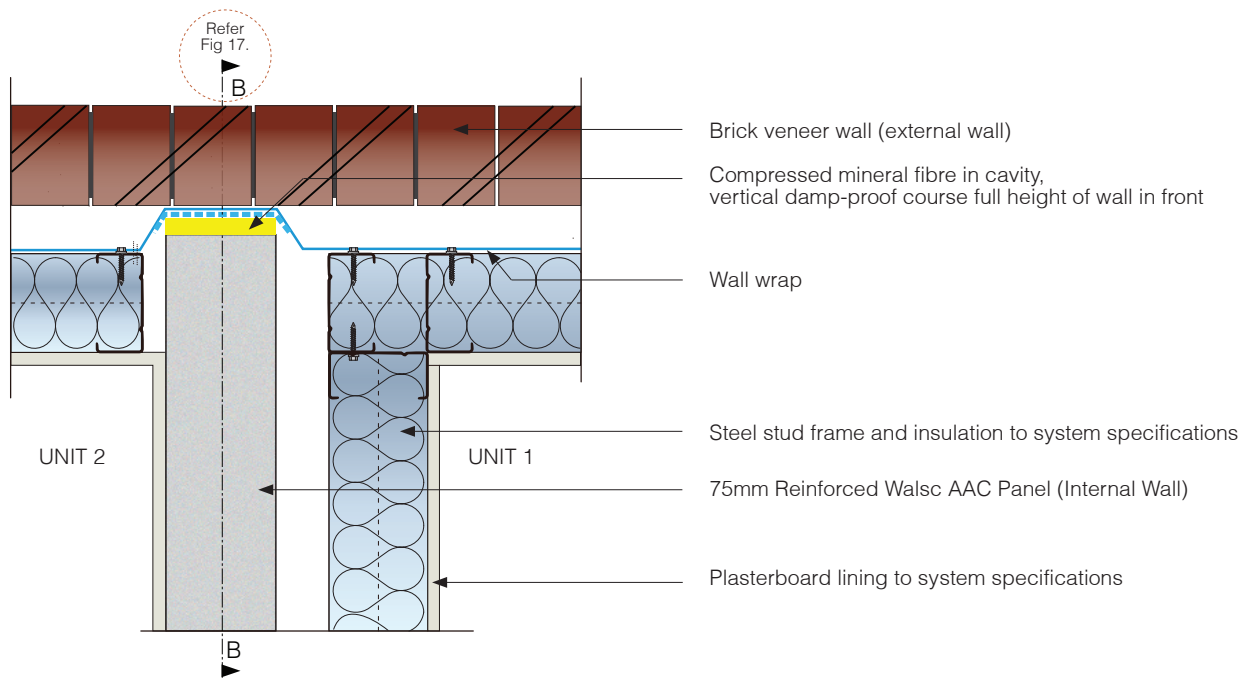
Inter-Tenancy / Corridor Wall to Brick Veneer Junction Detail
